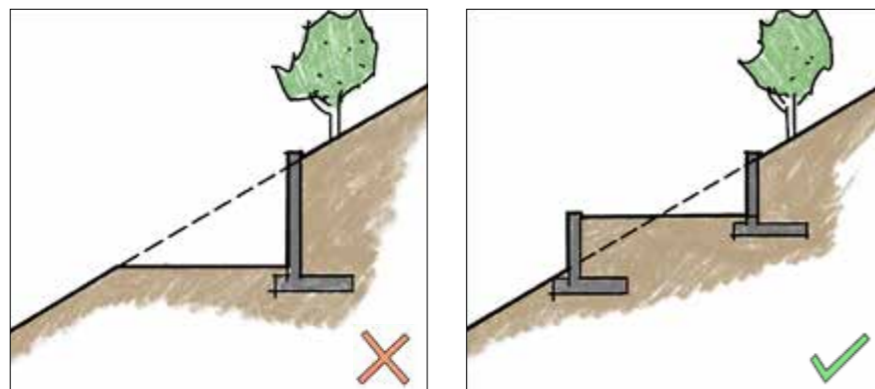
Where retaining structures are needed, avoid or minimise the need for overbearing retaining walls with more modest and regular retaining walls
